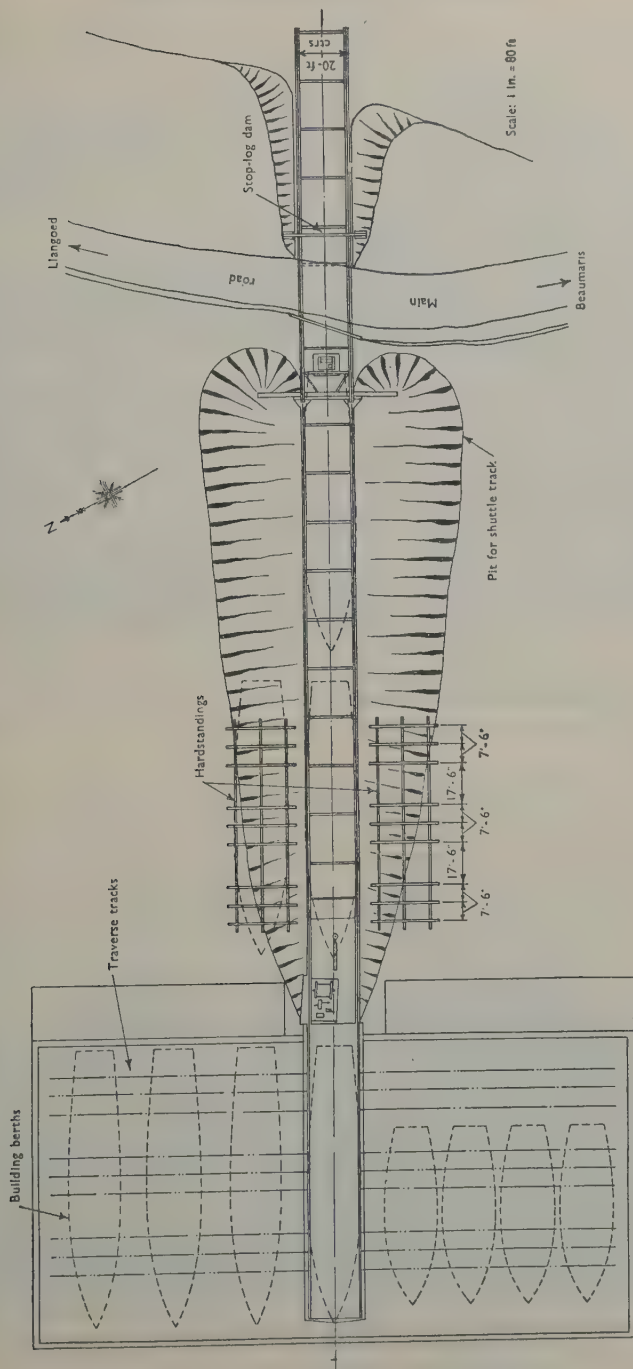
PLAN OF SHORE END OF SLIPWAY
